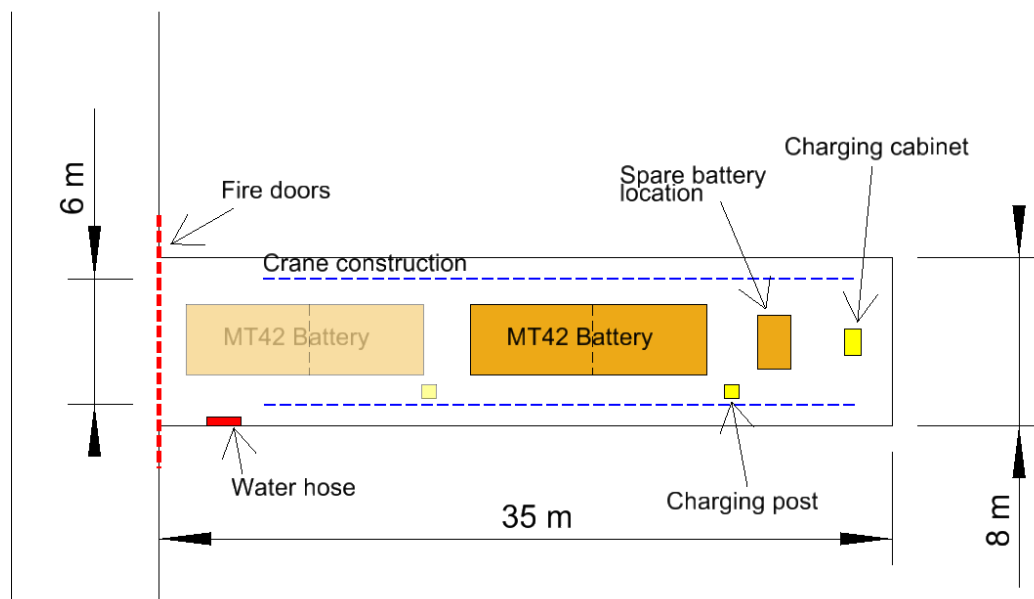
Battery Bay layout with two MT42 Battery trucks parked for charging
